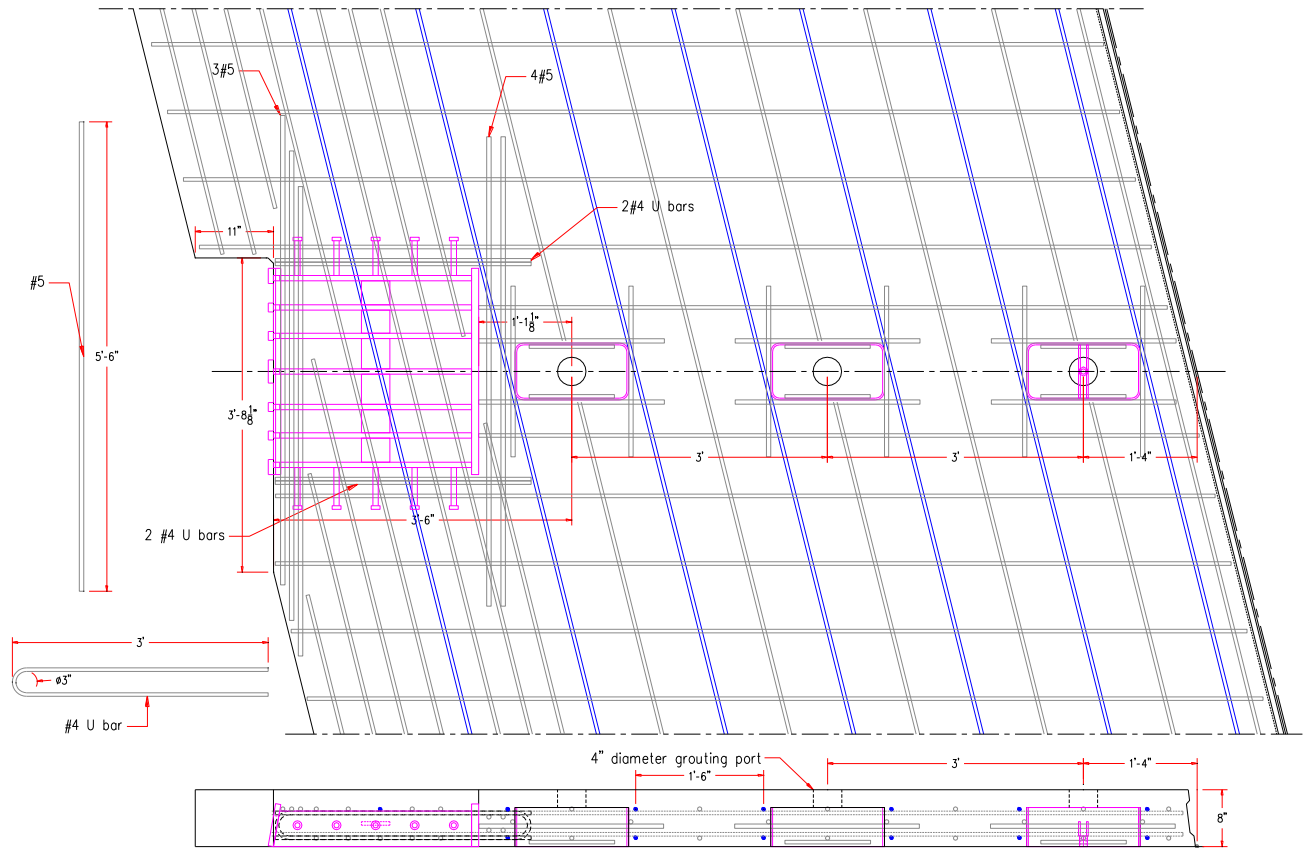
Reinforcement of the end panel and the anchorage zone
